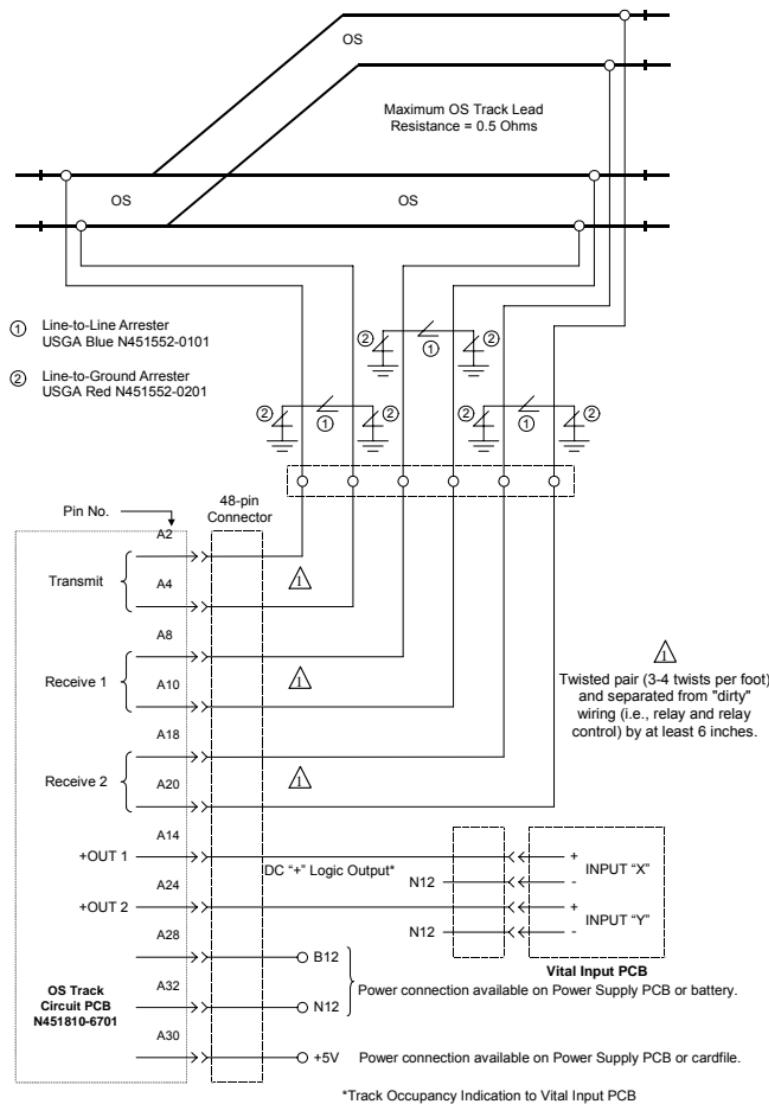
OS Track Circuit PCB - Basic Interface Wiring
